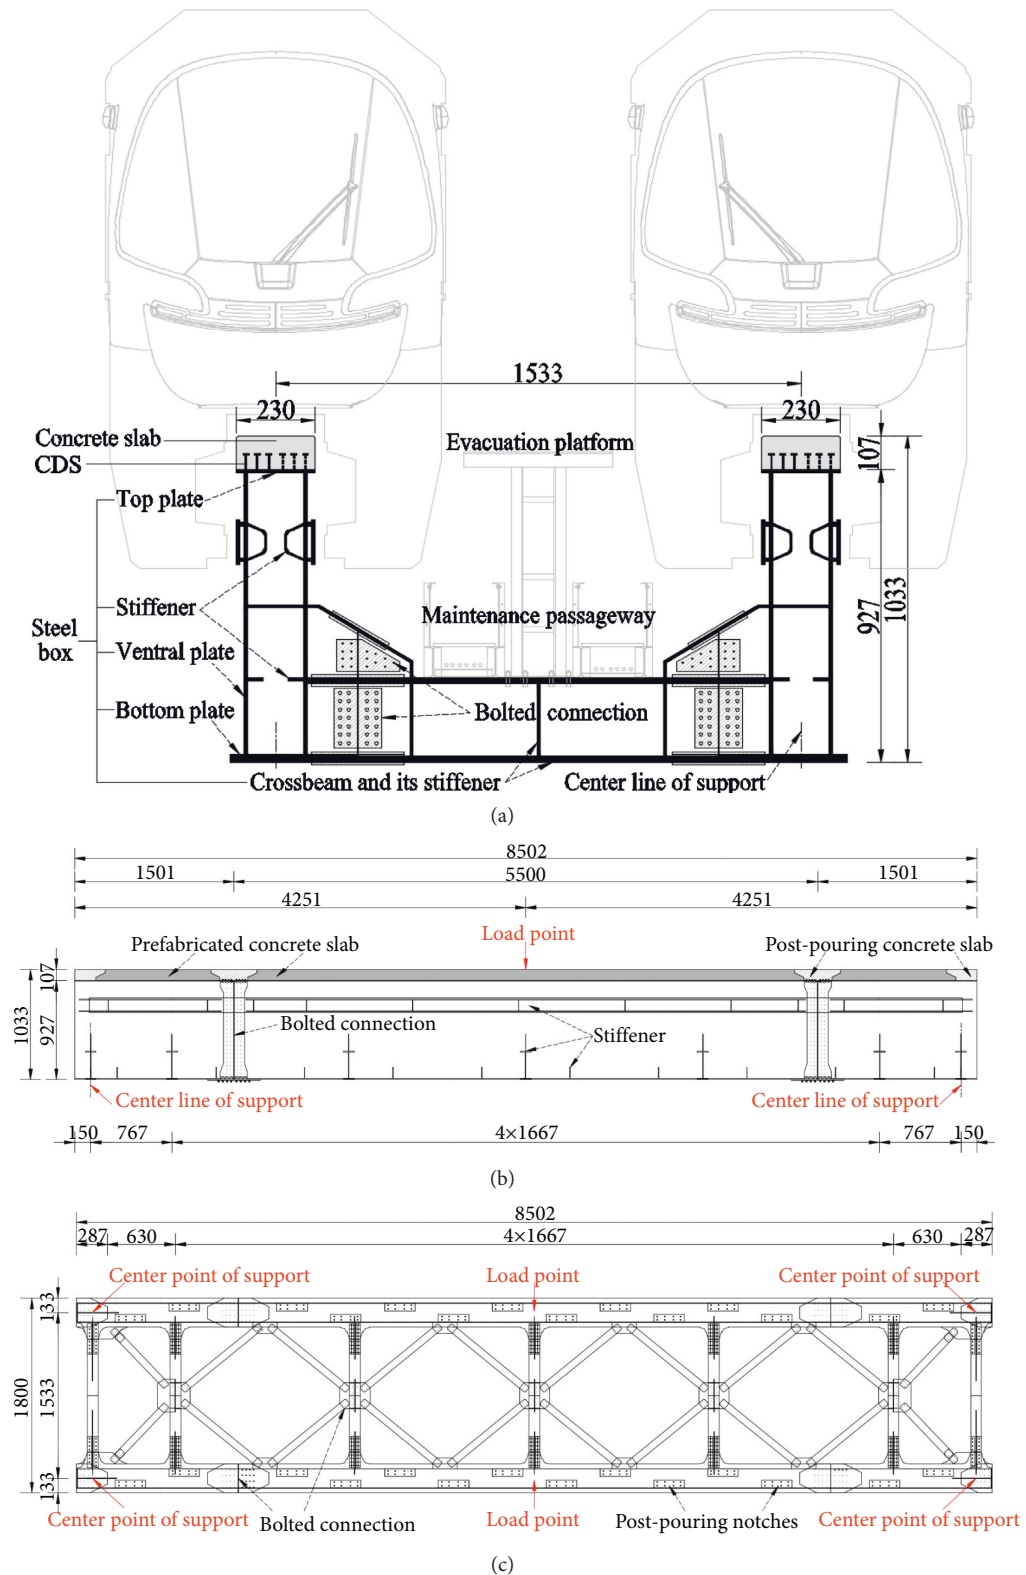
Scale model of test beam of straddle monorail with a scale ratio of 1:3 (unit: mm). (a) Side view. (b) Front view. (c) Top view.
